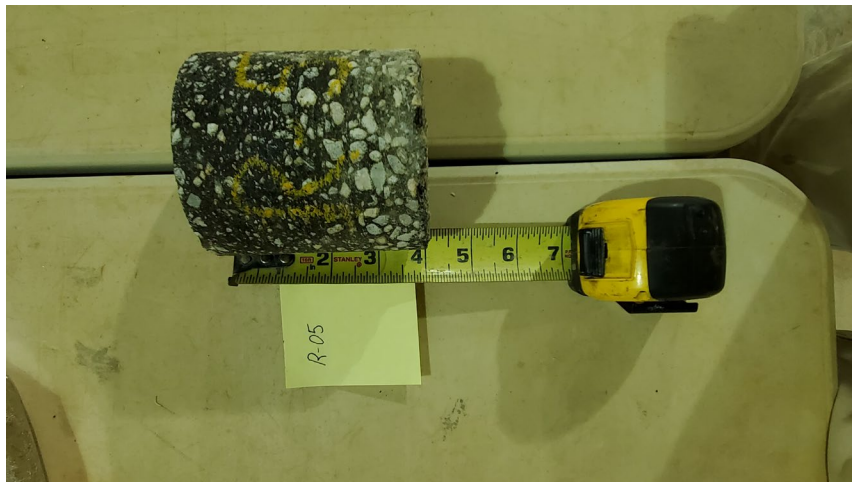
Core at R-05 (Core oriented with asphalt surface to the left)
